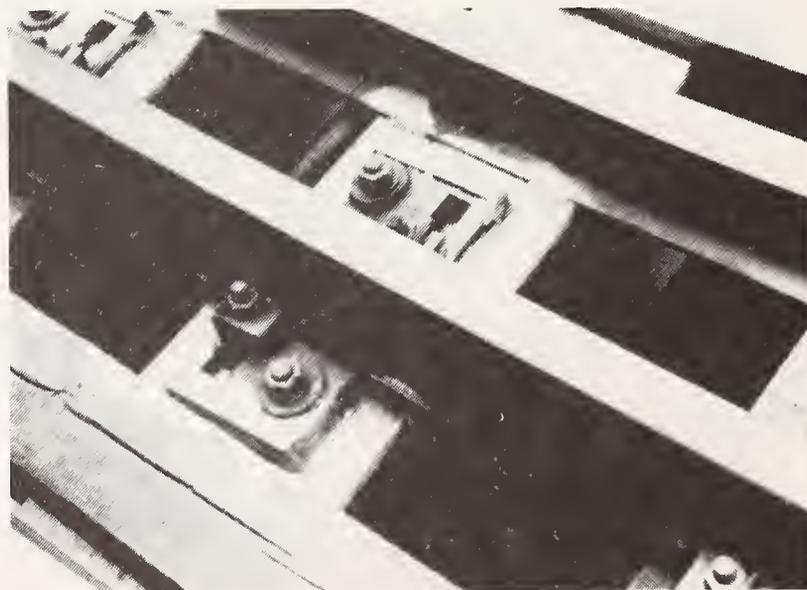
CTA INSTALLATION OF LANDIS FASTENER BOLTED TO TRANSVERSE DECK MEMBER
